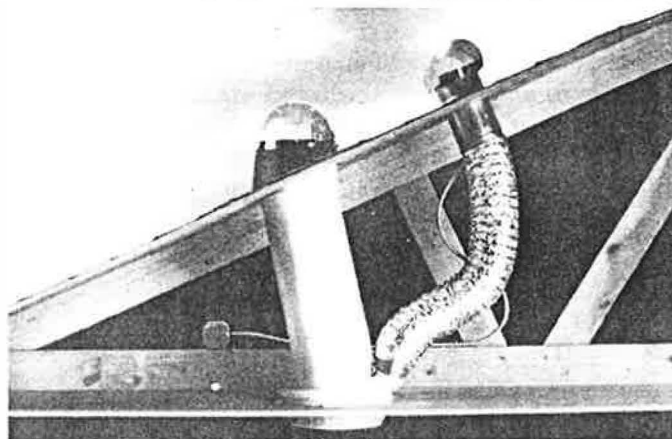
A 10-inch diameter Solatube with an integrated 150-cfm exhaust fan. The motor-and-fan assembly are located just beneath the roof decking for quiet operation.
